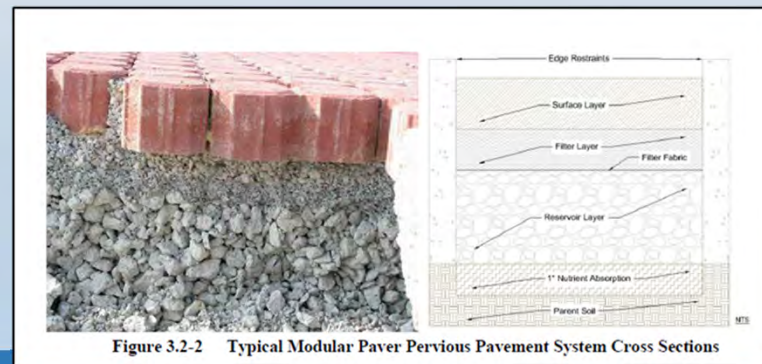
Typical Modular Paver Pervious Pavement System Cross Sections
